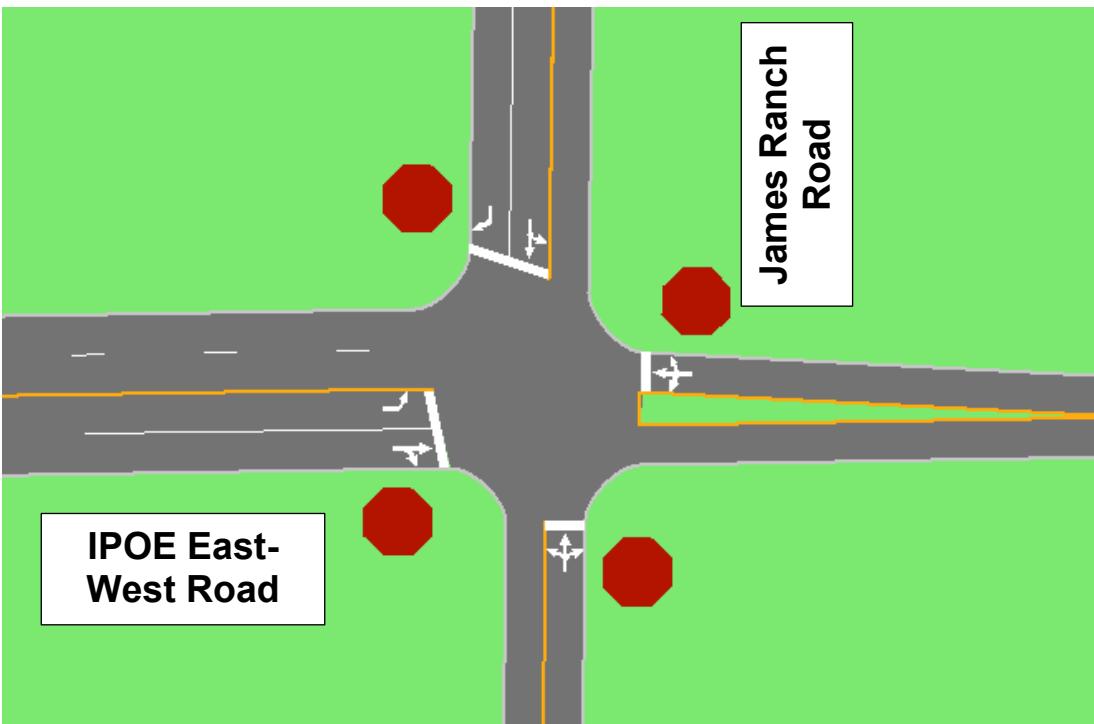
IPOE East Intersection Diagram - 2028 Build
